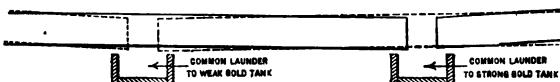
ELEVATION OF LAUNDER SYSTEM FOR CONVEYING SOLUTION FROM VATS.
